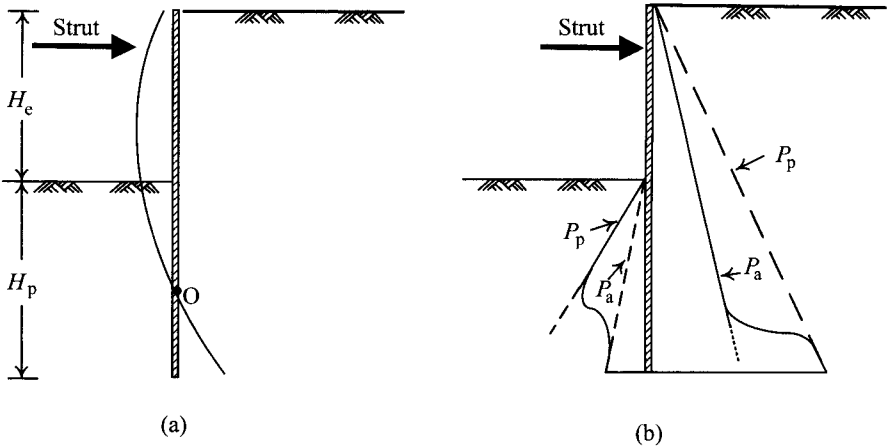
Fixed earth support method: (a) deformation of the retaining wall and (b) distribution of earth pressure.
